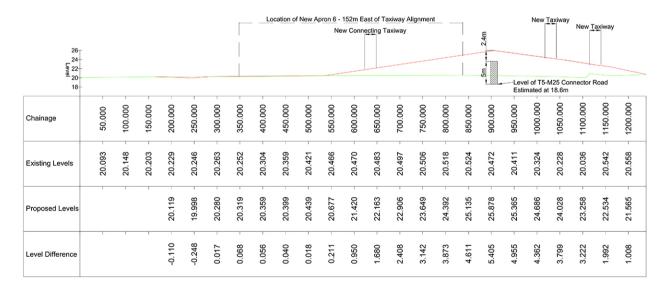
Proposed Cross Section Through T5/T6 to M25 Exit Spur Road
